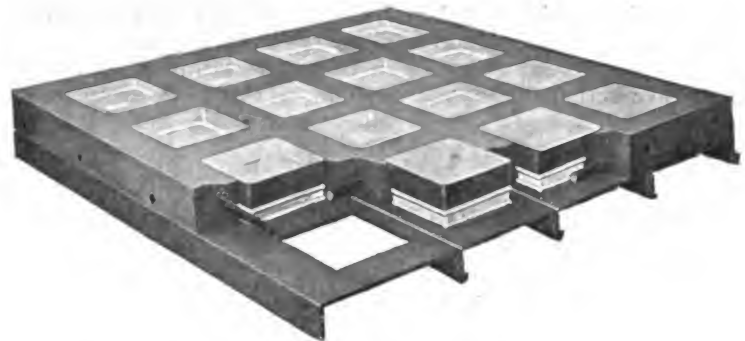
3-WAY QUICK-SET SYSTEM OF SIDEWALK LIGHTS
